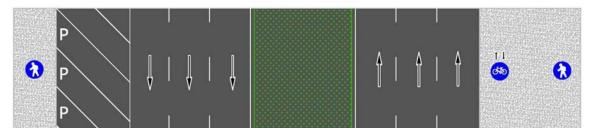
J: Old Colony Avenue Alternative C.1 Cross Section with Extended Sidewalk
